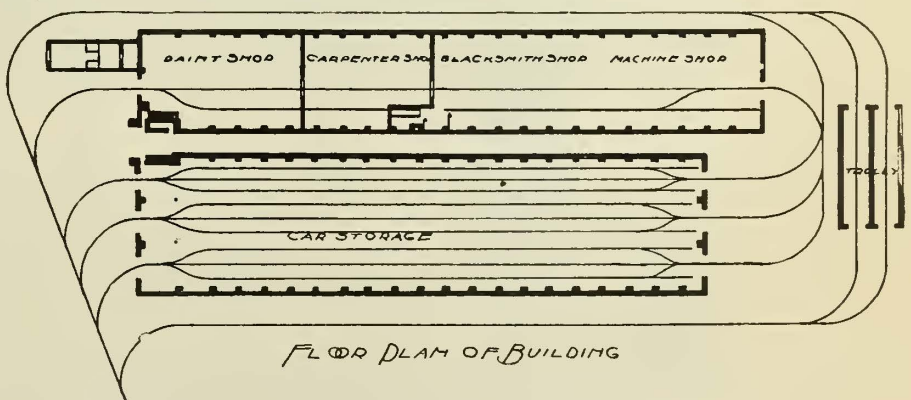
PLAN OF CAR HOUSE—WOODLAND AVENUE AND WEST SIDE RAILWAY.
